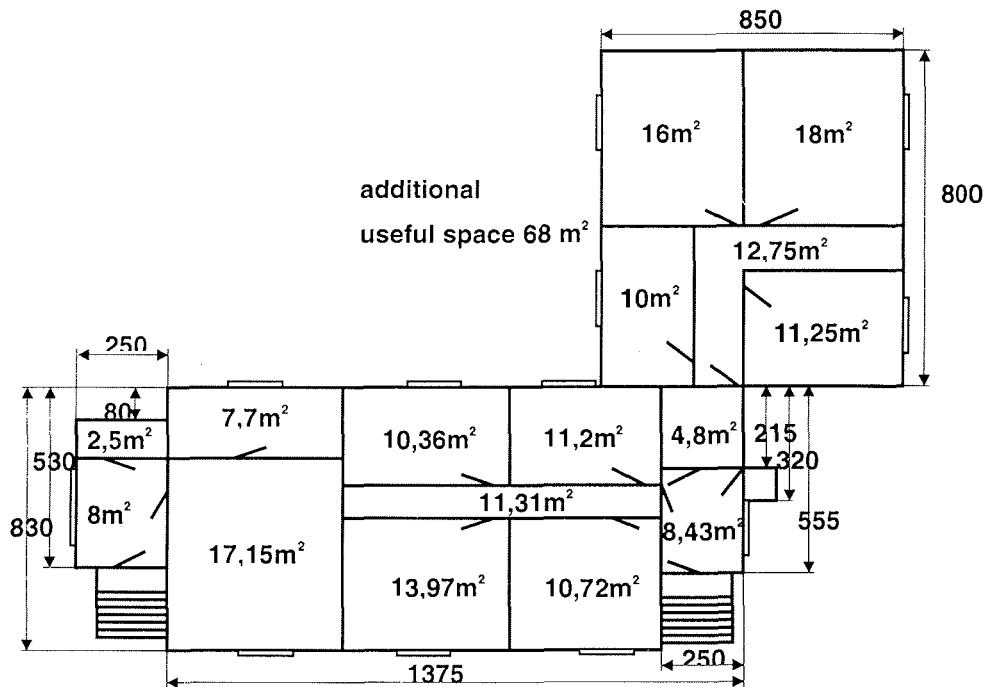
Samoylov station building with extension proposal (values in cm)
